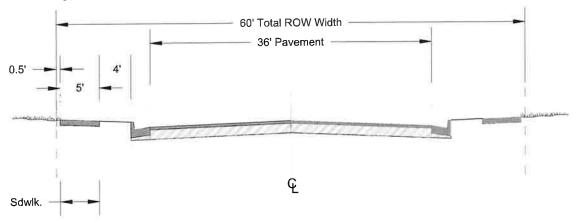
Typical Urban Nonresidential Collector Cross Section
